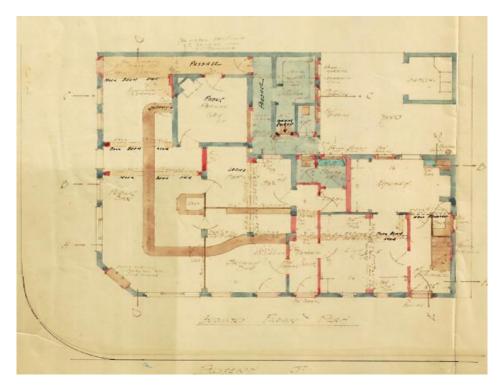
Approved 1930s floor plan for the alterations to the former Court House Hotel.⁶³
